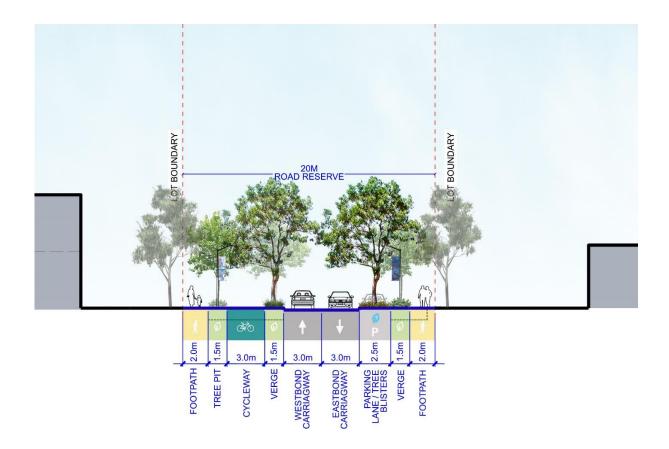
Proposed 20.0m Secondary Circulation Route with Separate Cycleway Typical Cross-Section
